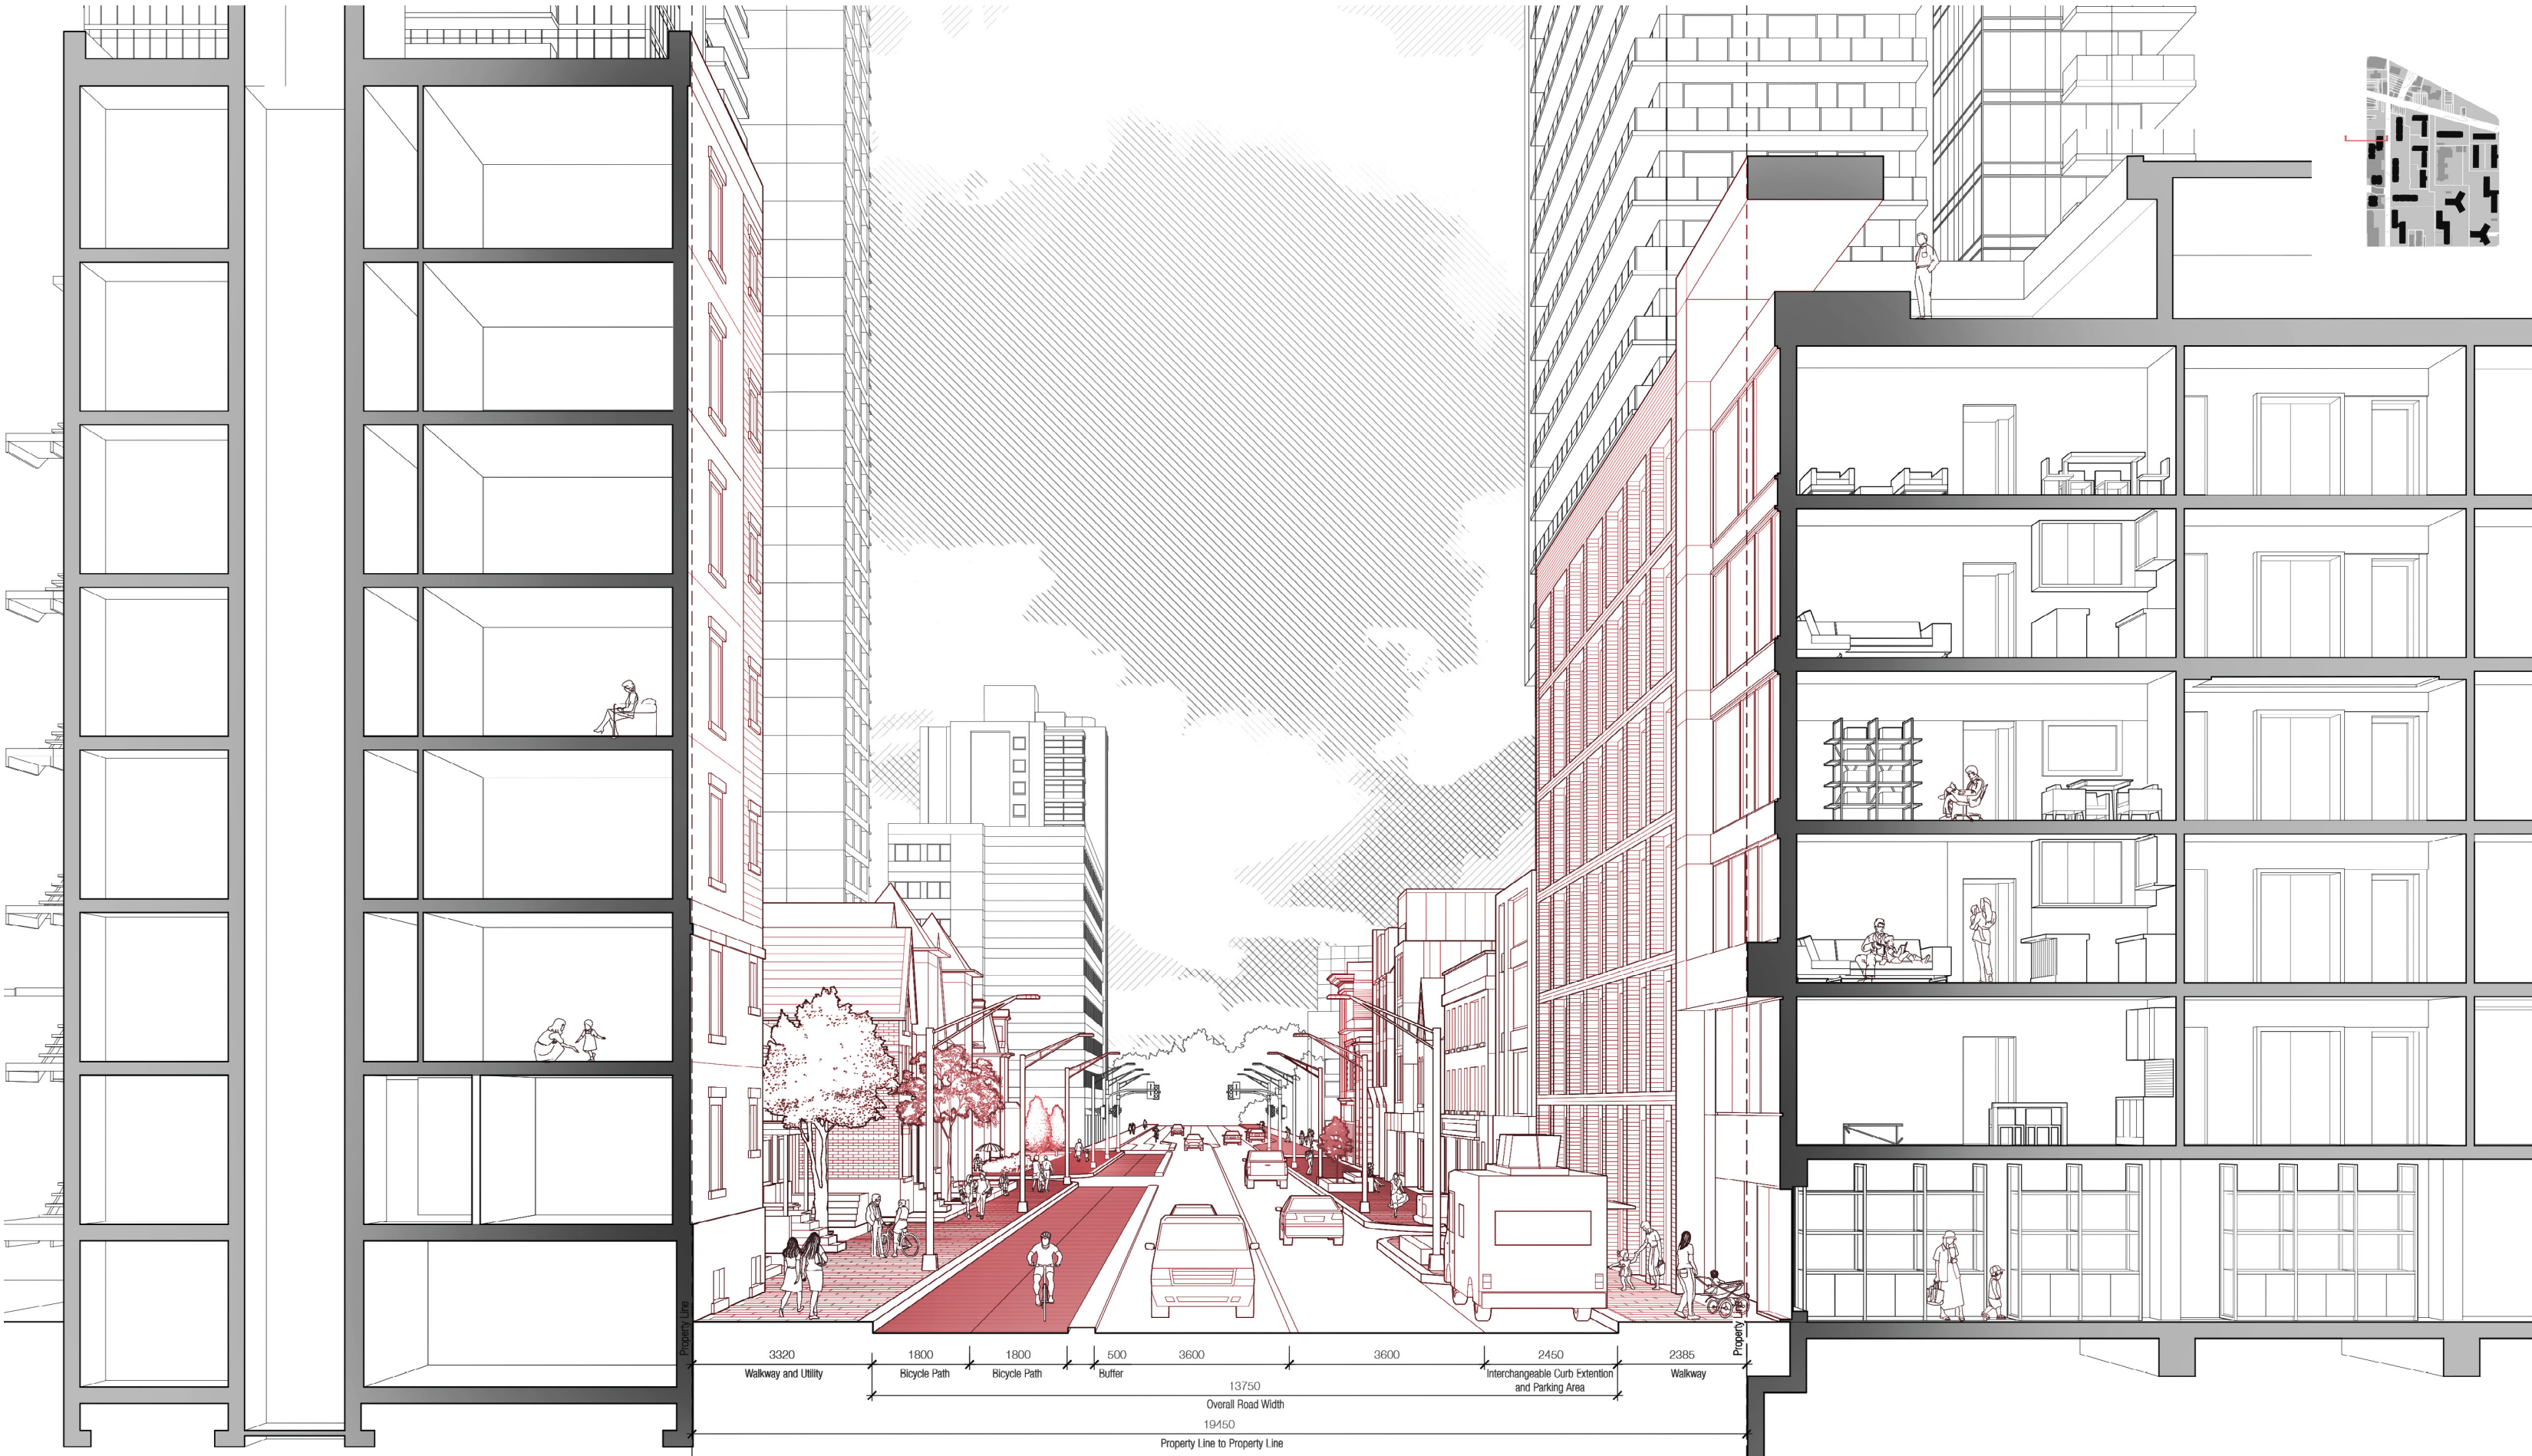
Street Section- Sherbourne Street (Avenue)
